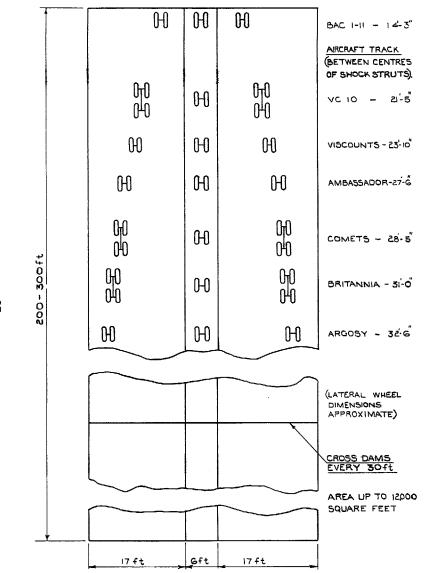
Possible pond dimensions for wheel arrangements shown.
